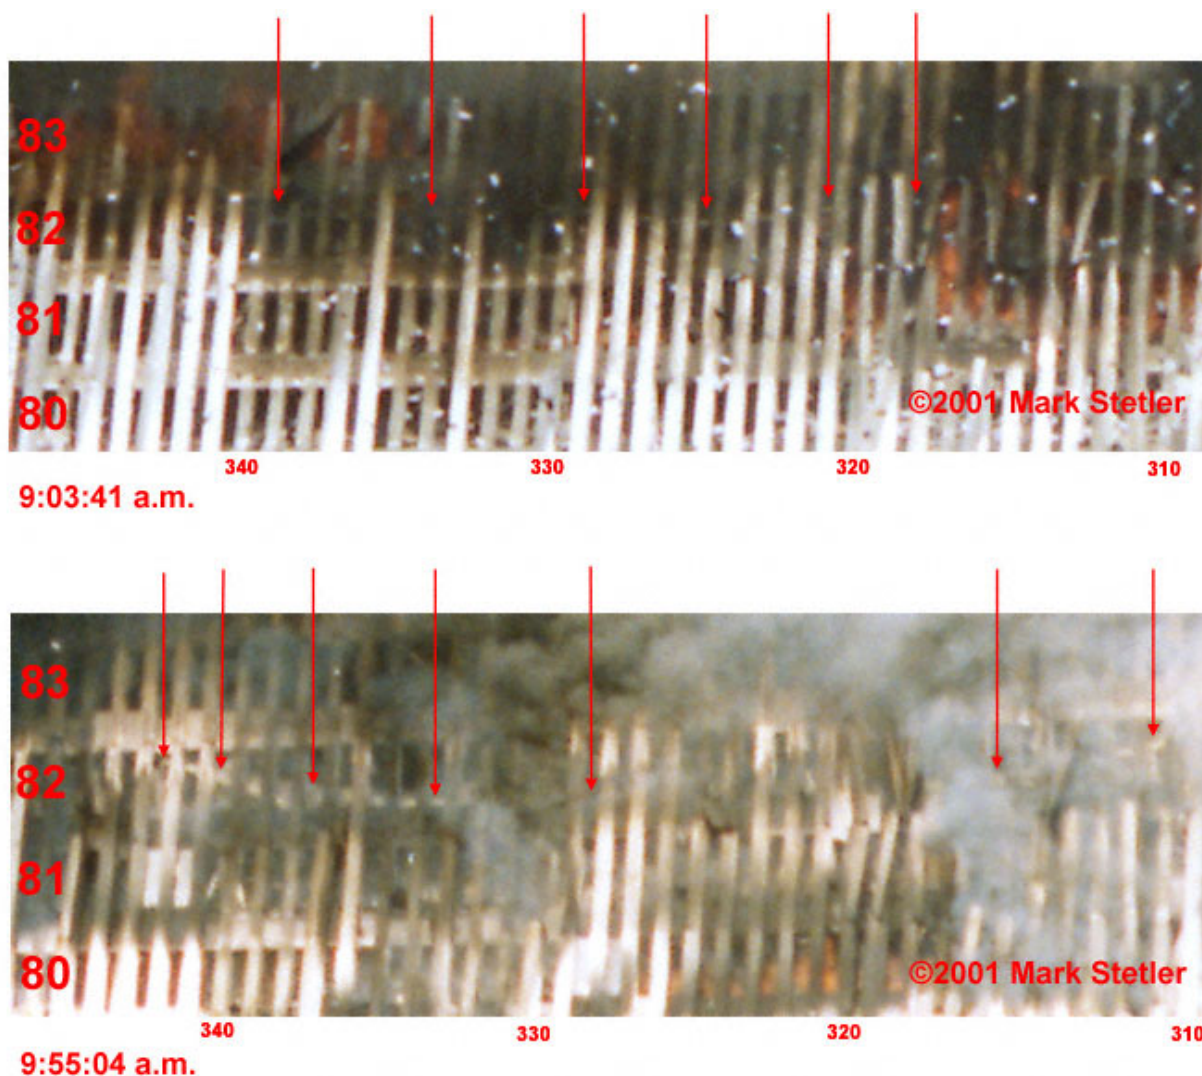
Images of the east face of WTC 2 taken shortly after the plane struck and shortly before the tower collapse are shown. An object that is most likely a floor can be seen through windows on floor 82 as indicated by the arrows. The object has dropped lower between the times the two photographs were taken.
